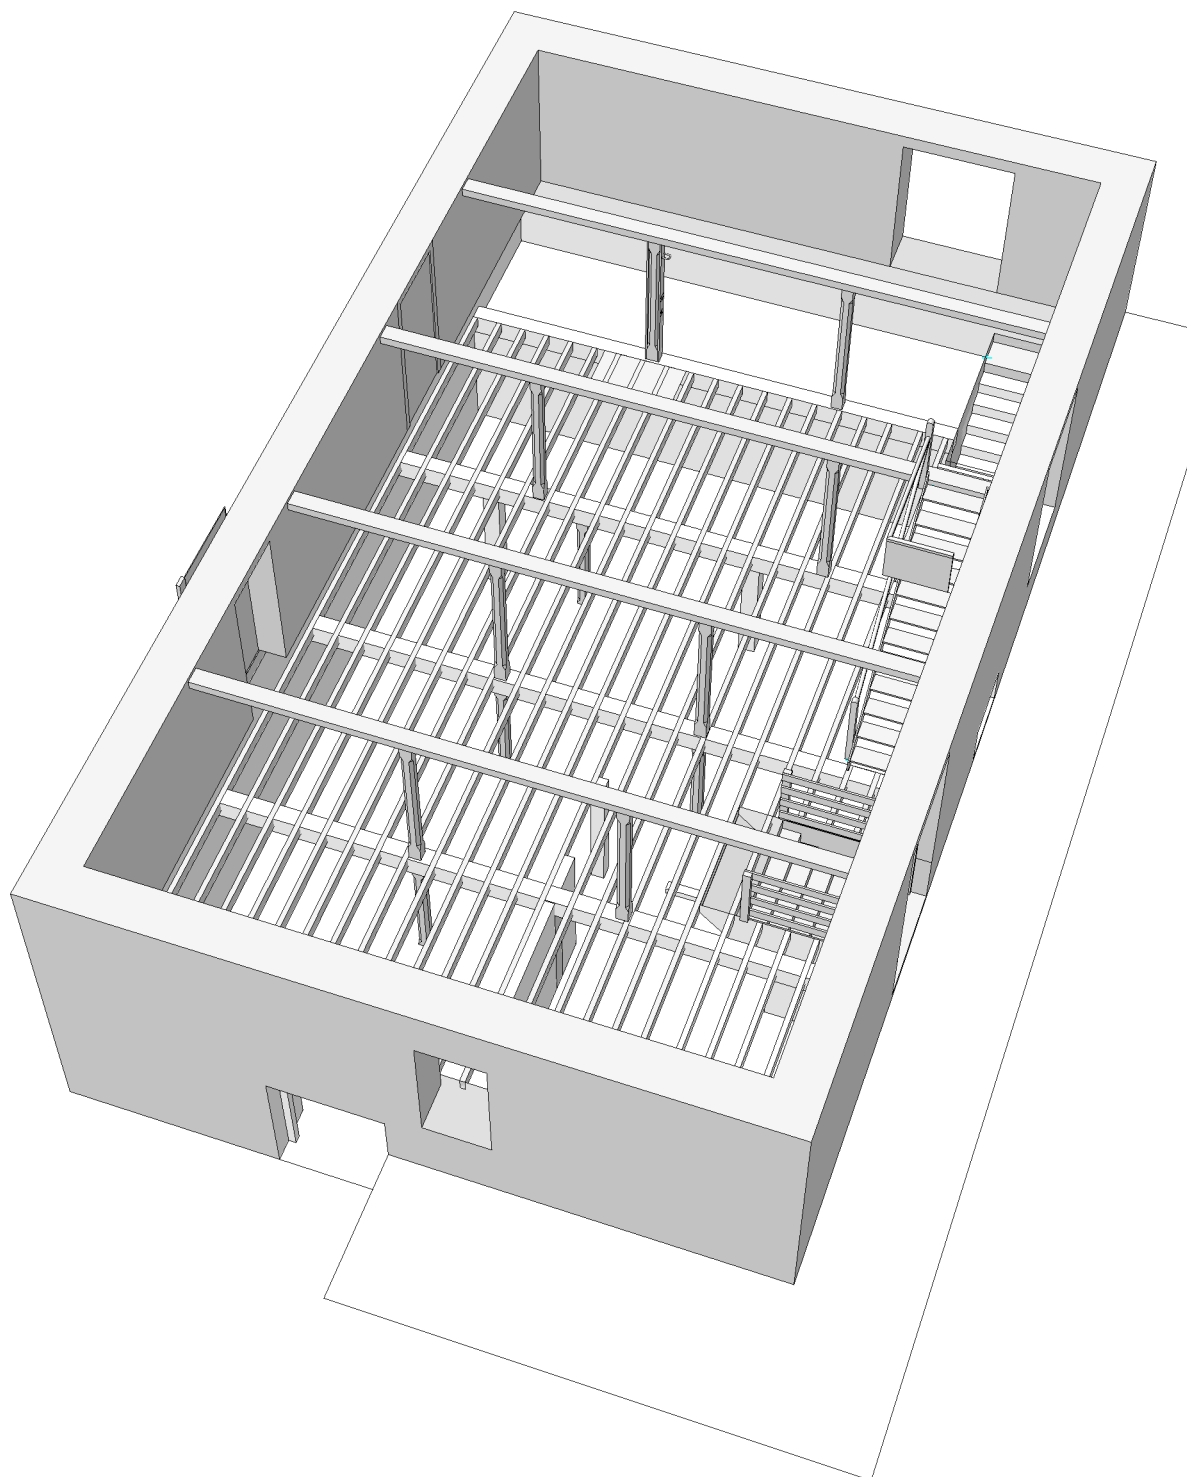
South warehouse - arrangement of beams and piers in basement and on ground floor
